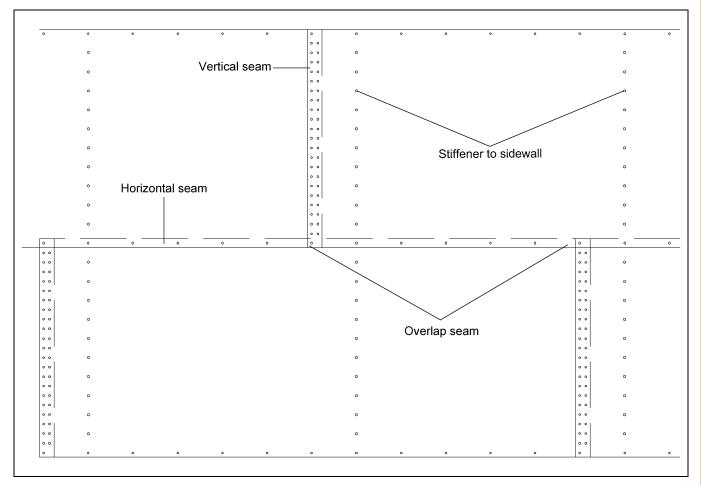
D Standard (17 Gauge through 20 Gauge) Sheet Bolting Detail (Viewed from outside of the bin.)
